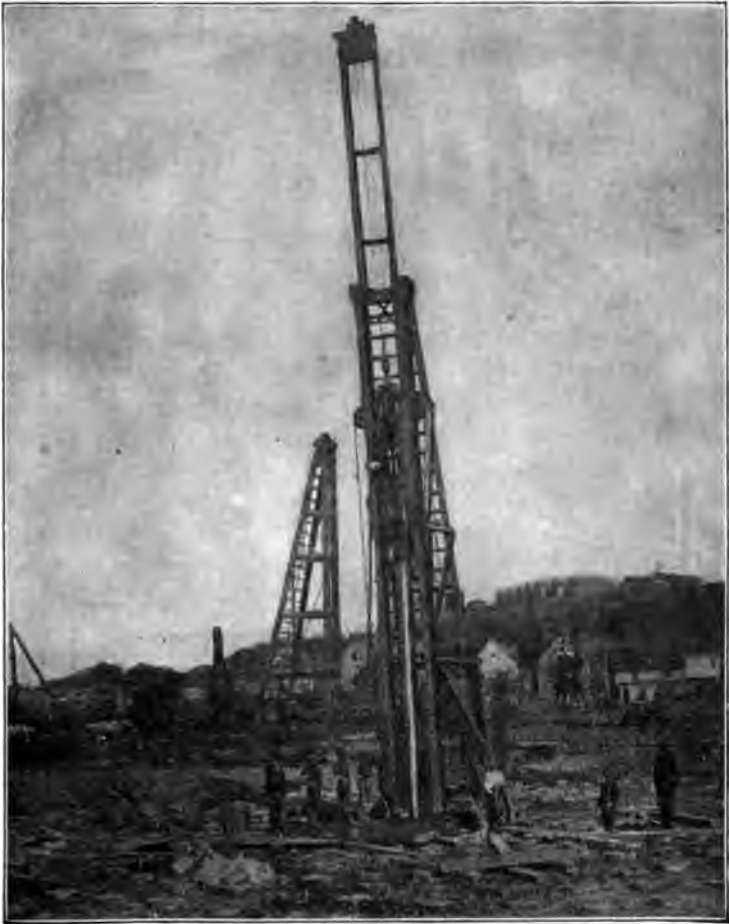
Pile Driver for Raymond Concrete Pile Work.
